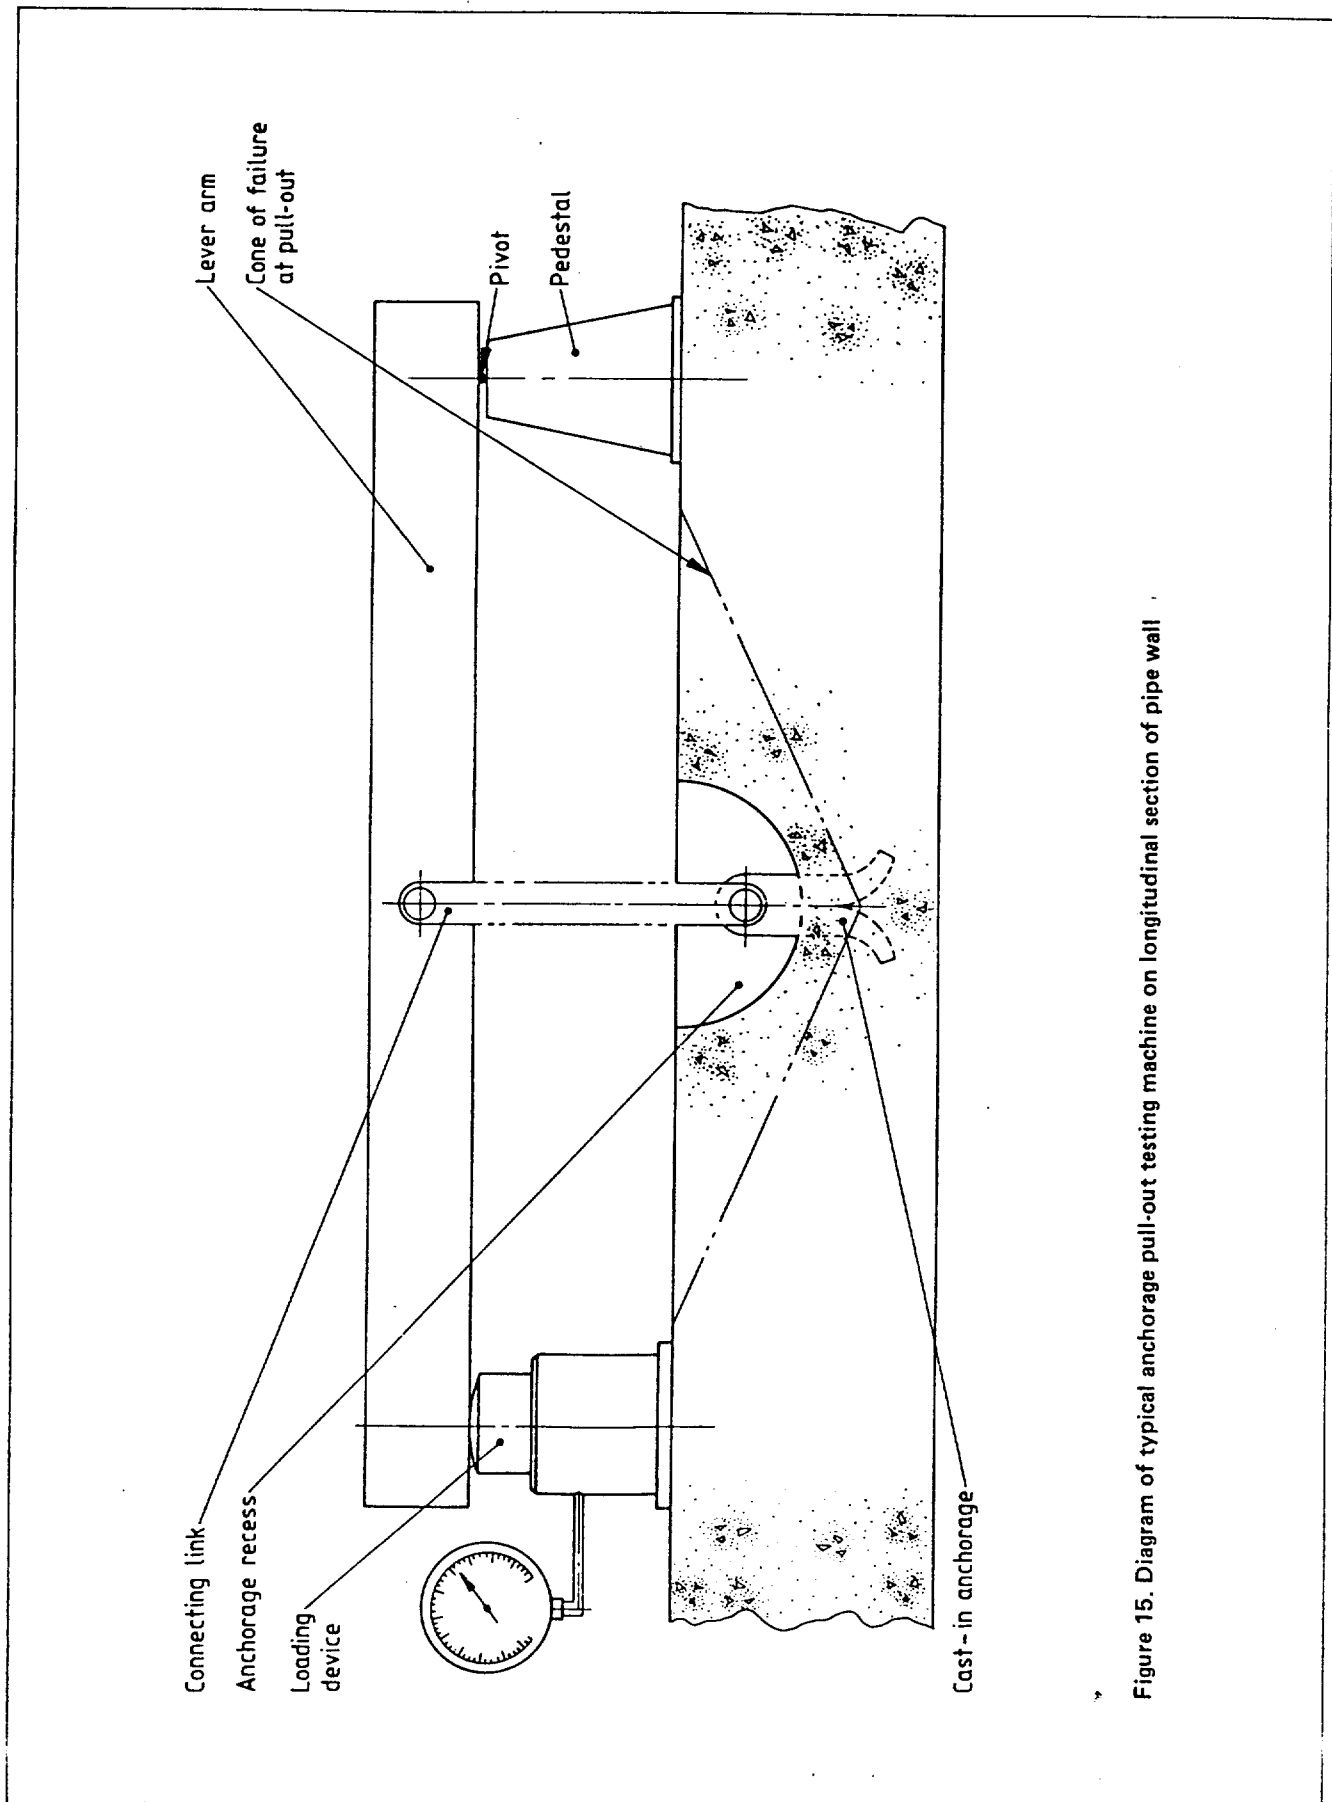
Diagram of typical anchorage pull-out testing machine on longitudinal section of pipe wall
